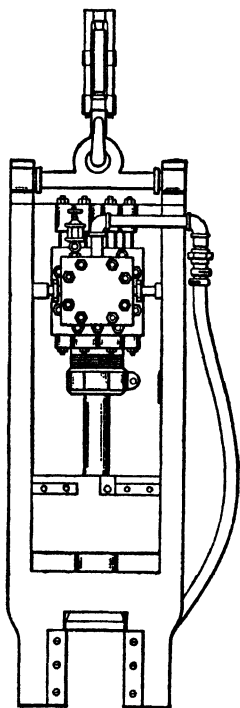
Large-size Power-hammer for Driving Sheet-piling Planks
